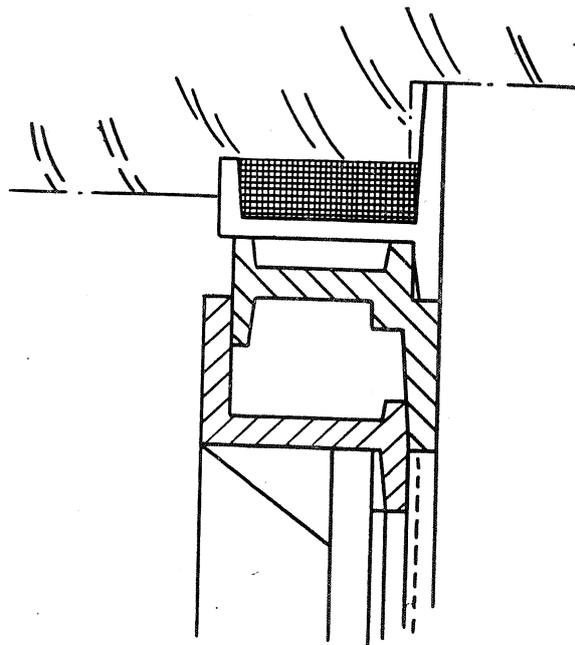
Sectional view of part of the window used in the test showing the framing and ventilating sections.
